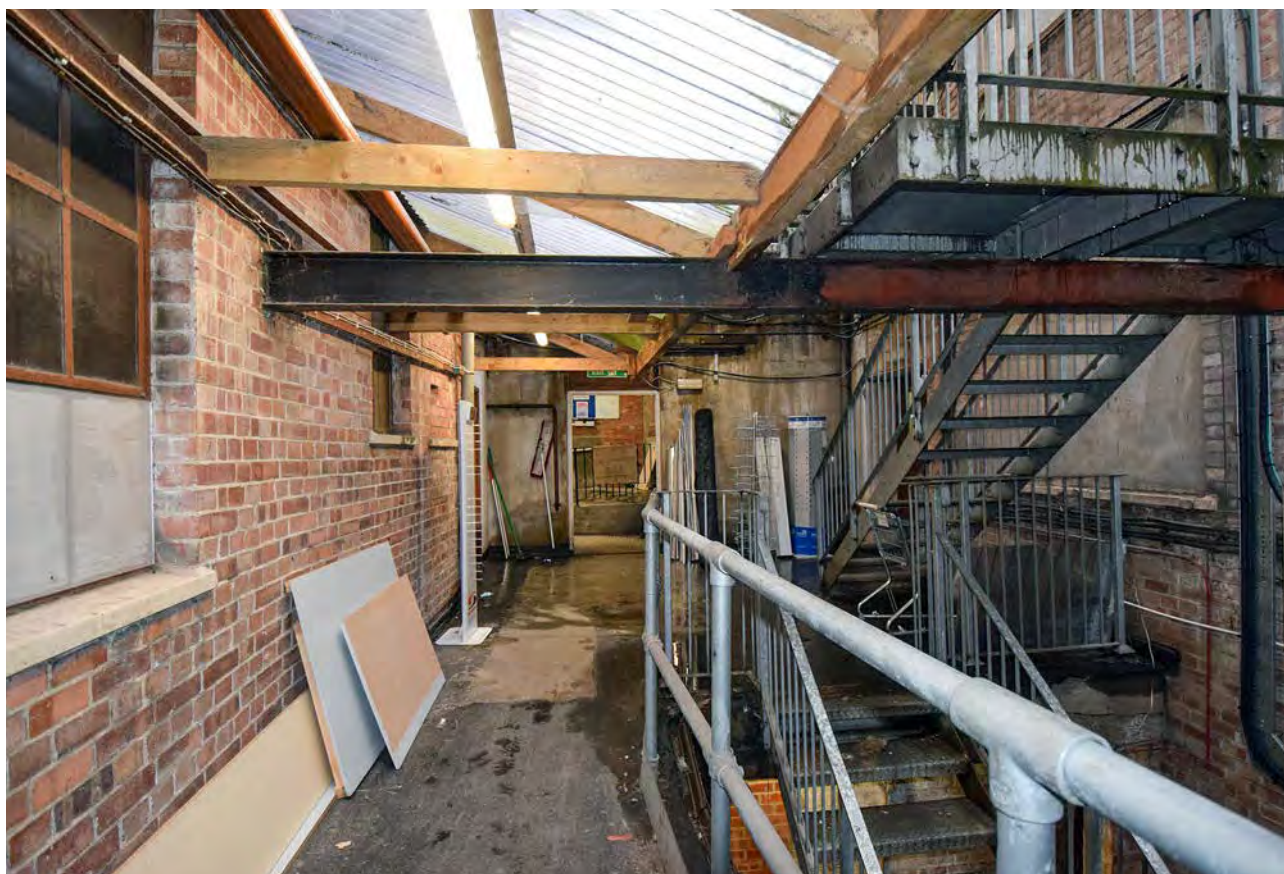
The ground floor of the central lightwell in 1 to 5 Broad Street, looking east
